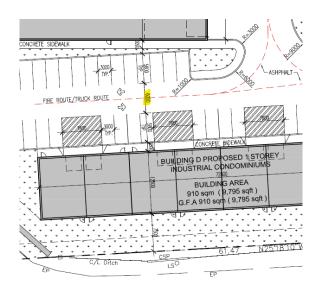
Image clip from the Site Plan showing where the minimum aisle width is shown to be less than the required 6.7m.
